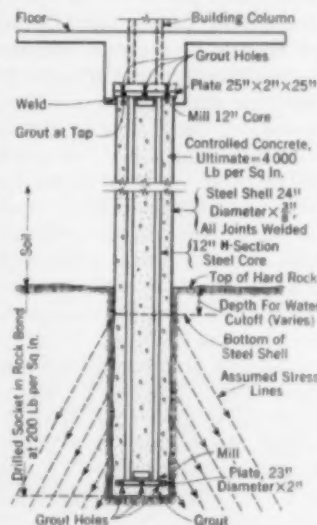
SPECIAL PILES FOR 1,500,000-LB LOAD
